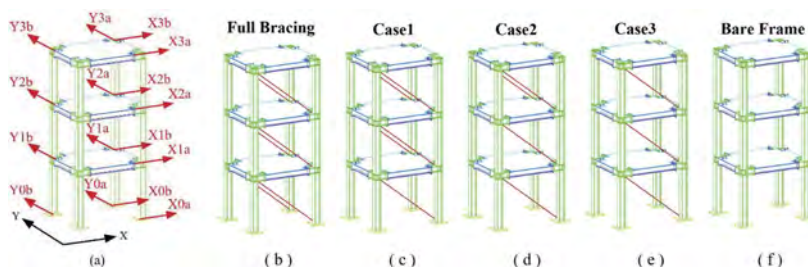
(a) Sensor layout of benchmark model H; (b) Full Bracing; (c) Case 1; (d) Case 2; (e) Case 3; (f) Bare Frame (redraw of Lin 2006).
